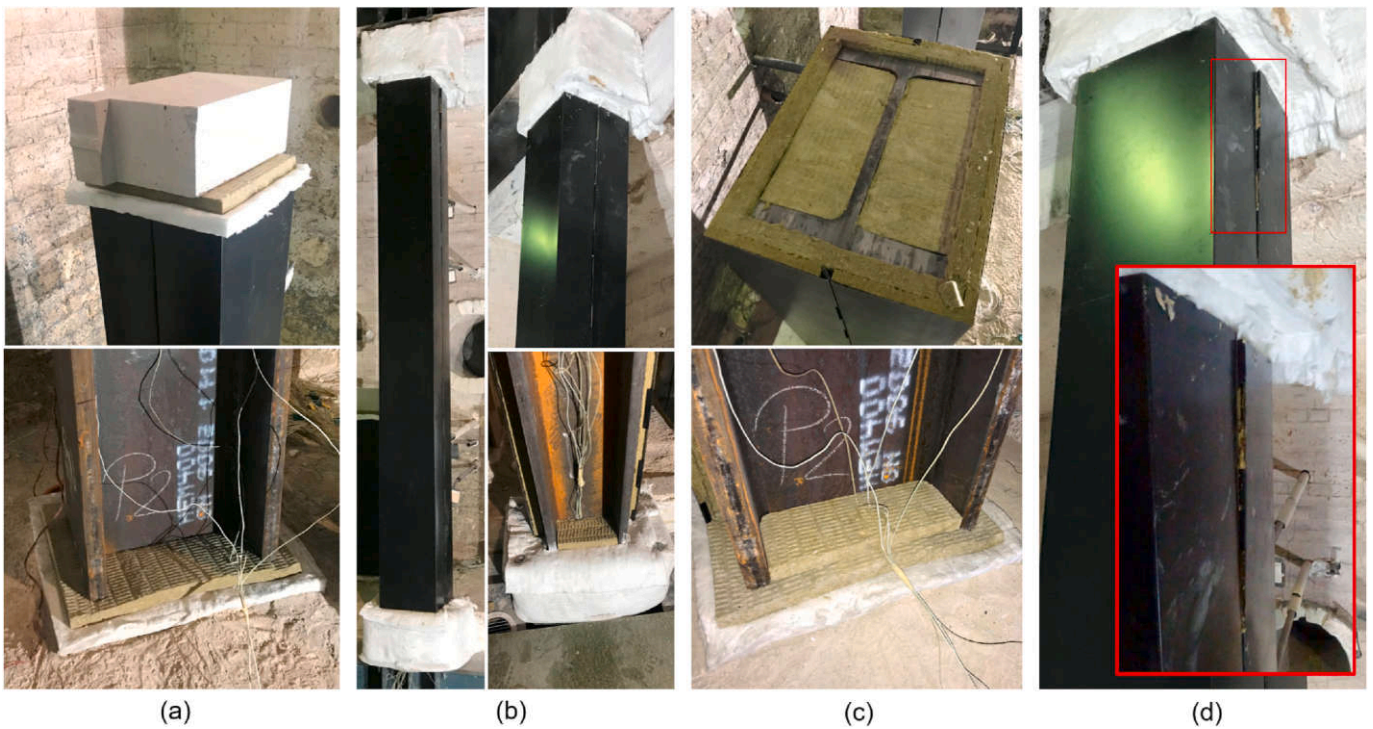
Details of specimens: a) Boundary conditions of unloaded specimens; b) Boundary conditions of the loaded specimen; c) Rock wool boards between steel profile flanges; d) Disconnection of two claws.
